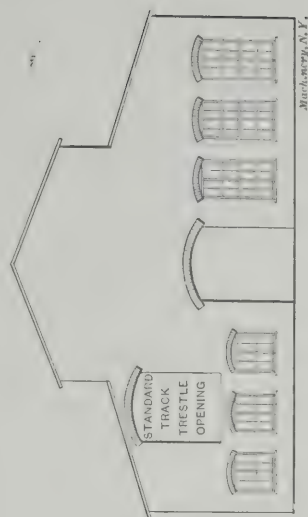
End View, showing Car Trestle Opening for Discharging Fuel
